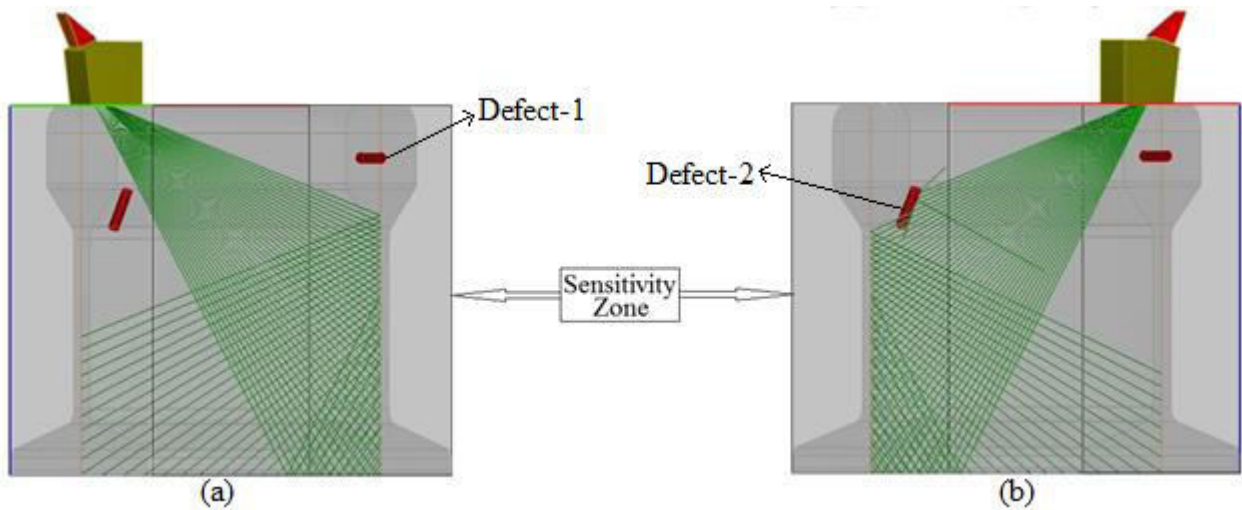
Wedge position for inspecting (a) defect-1 using PA2 (Wedge-3)
